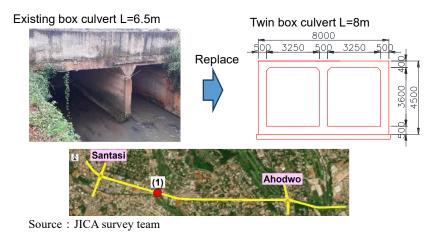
Structure (1): Twin Box Culvert L=8m
